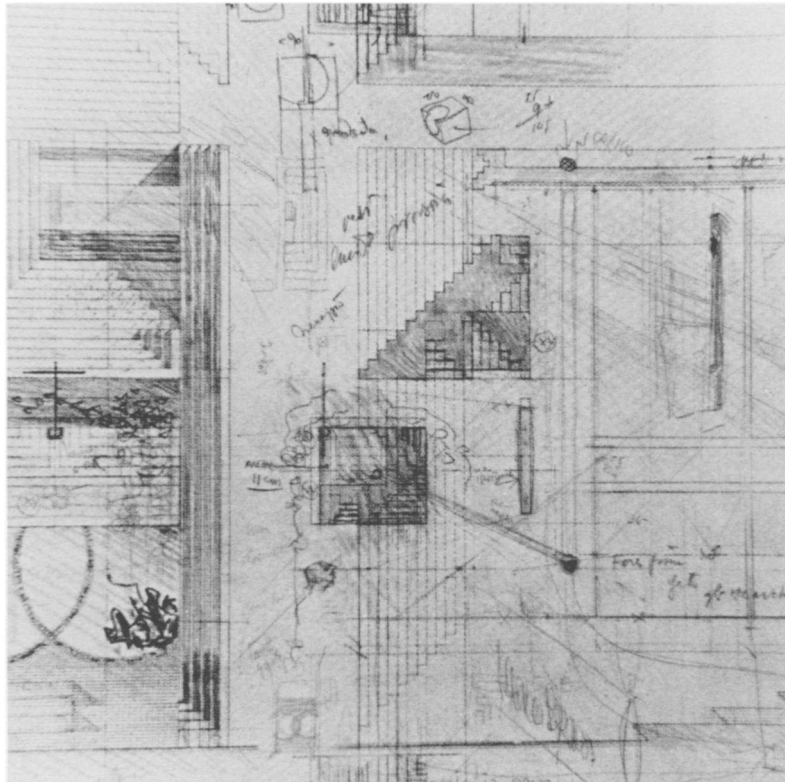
Carlo Scarpa. Entry, Brion Cemetery, detail of the Section.
